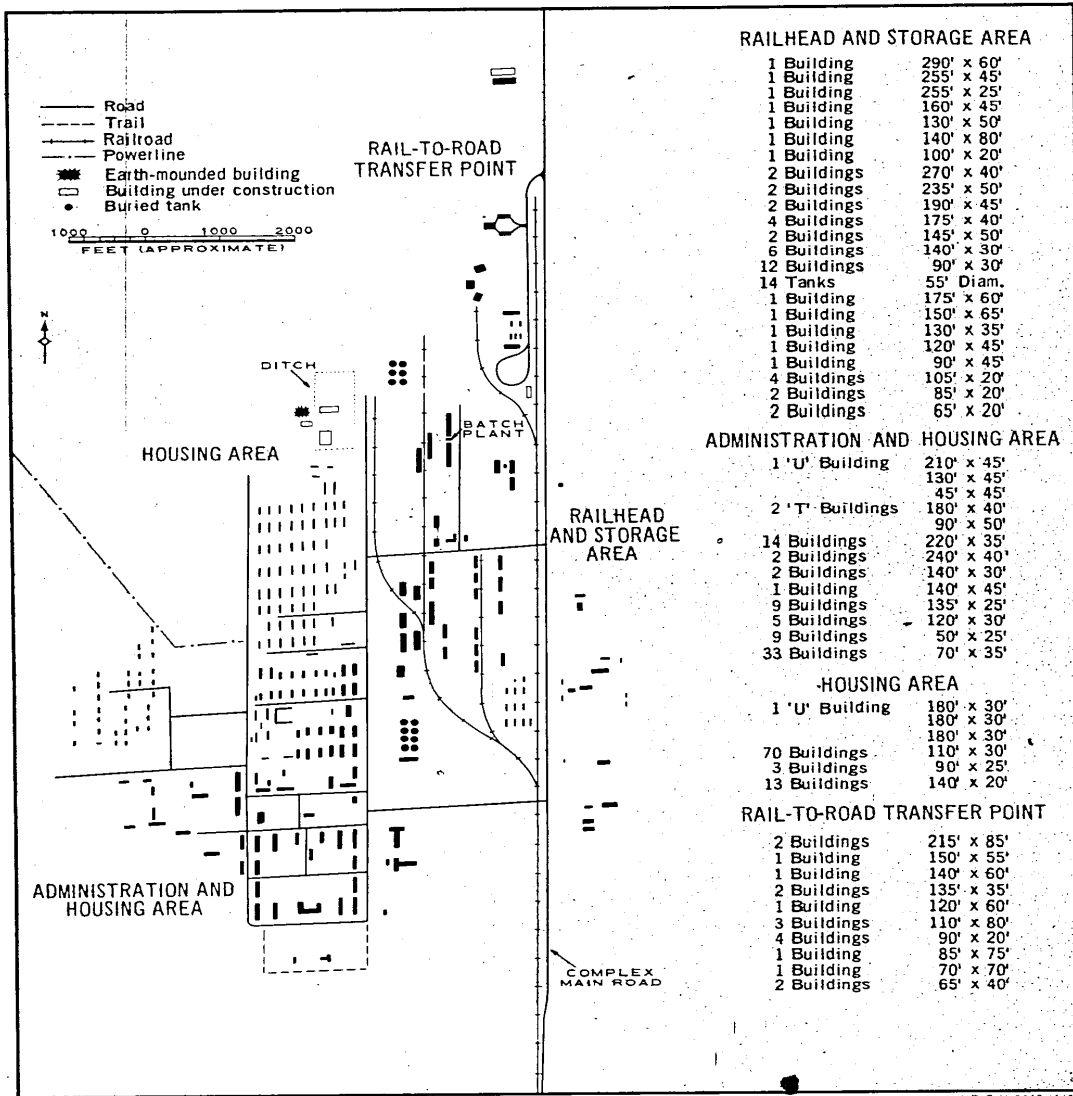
LAYOUT OF COMPLEX SUPPORT FACILITY AND RAIL-TO-ROAD TRANSFER POINT.
